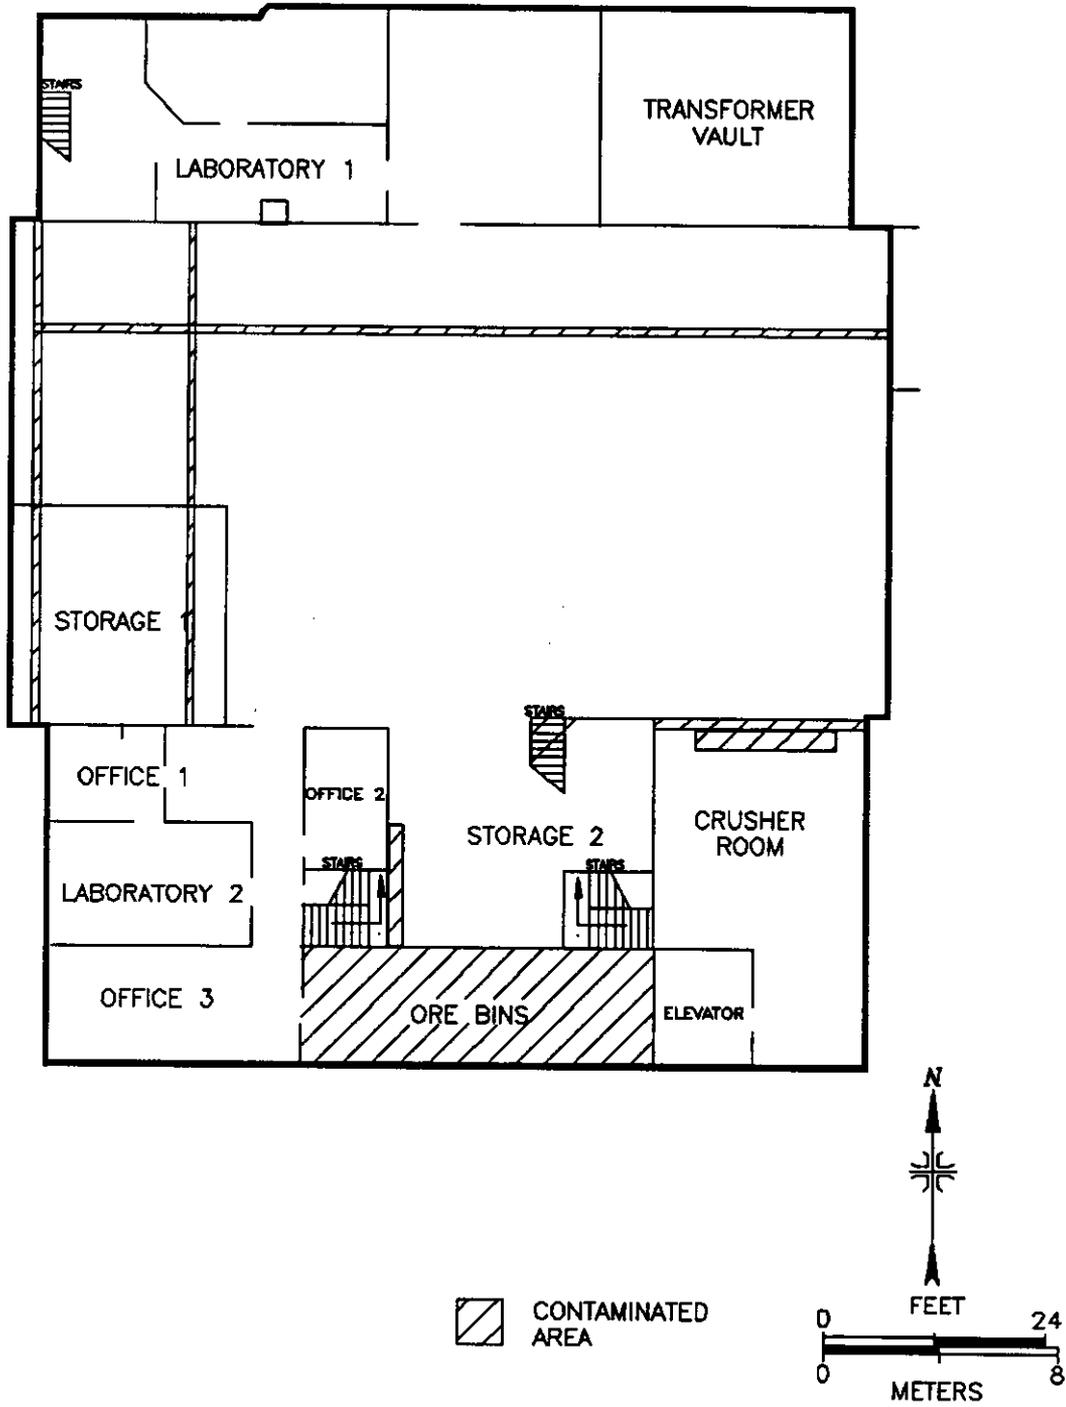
Plot Plan of Buidling 23, Second Floor
